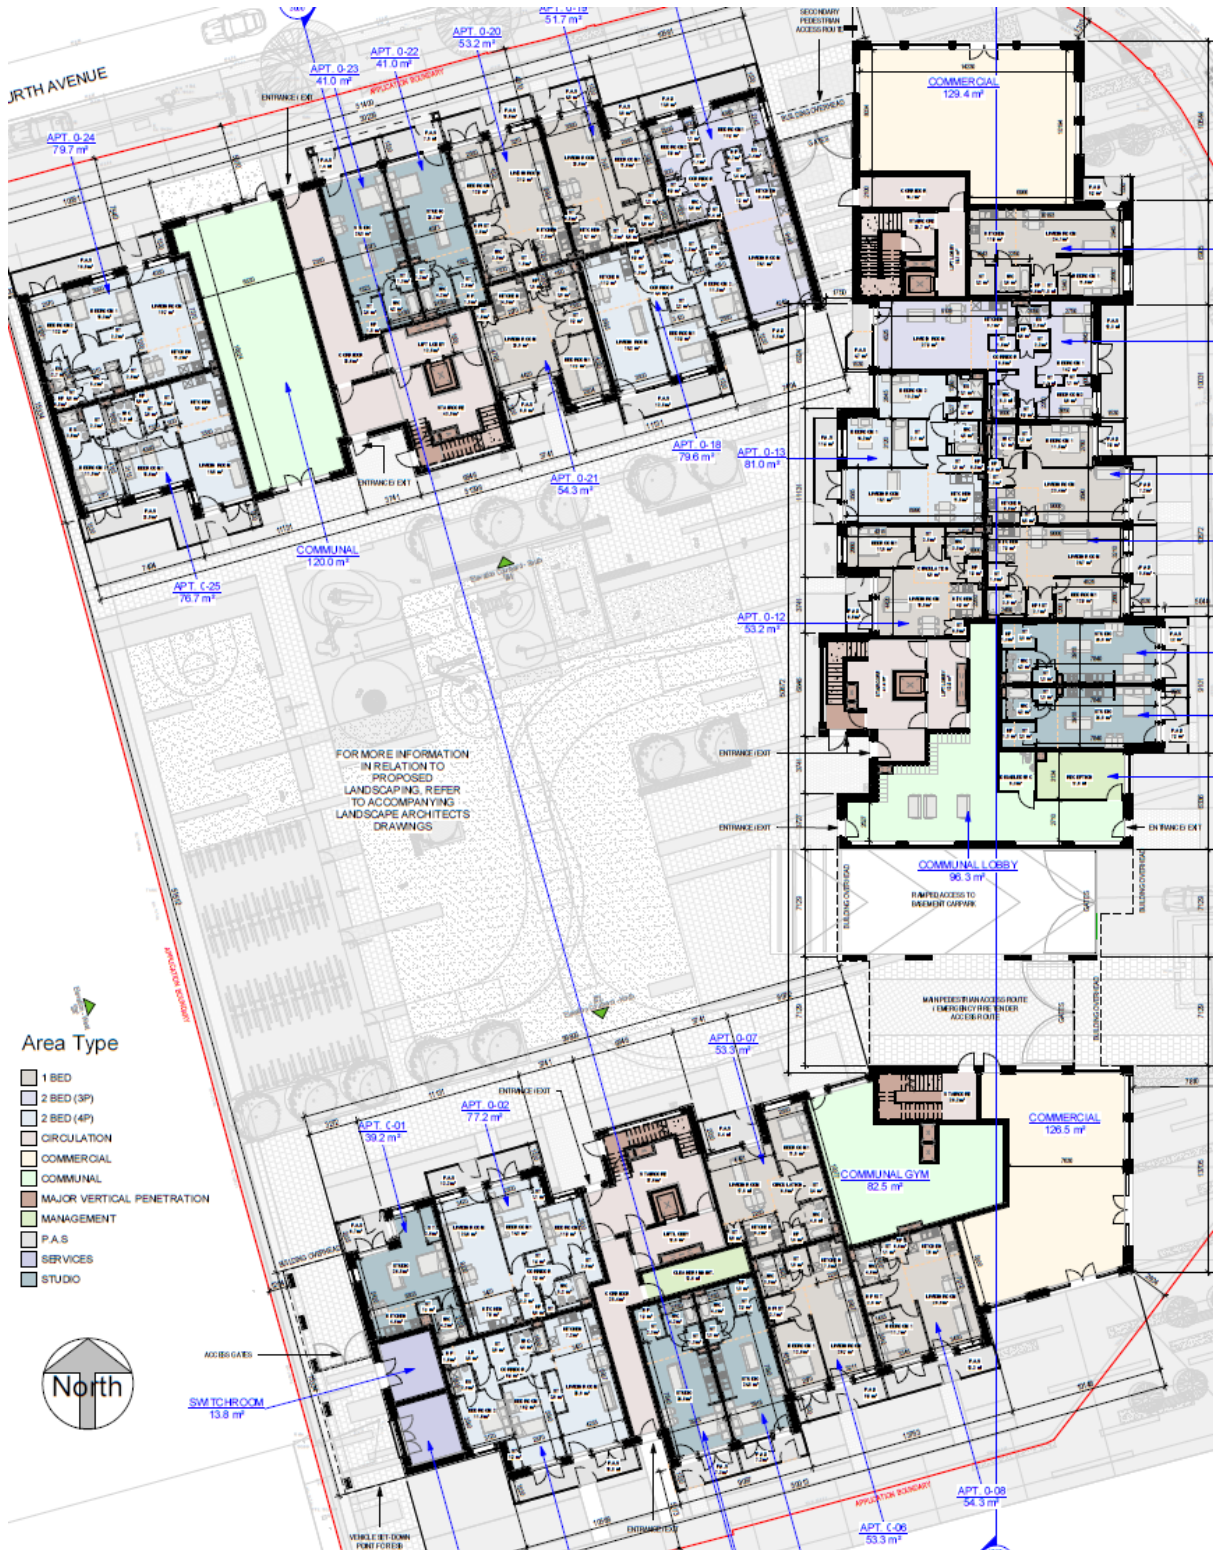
Ground floor plan of proposed development under ABP Ref. ABP-305725-19
